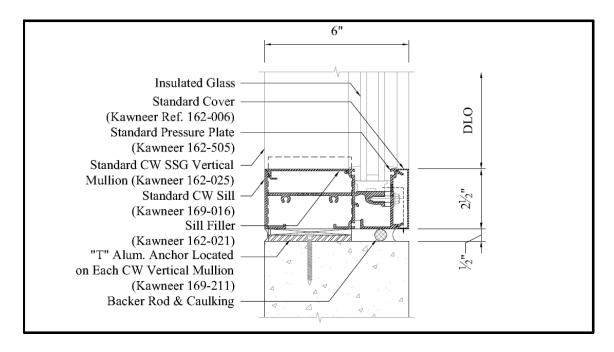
Standard sill mullion detail of Kawneer 1600 SS curtain wall system. Adapted from Kawneer Inc. (2014).
